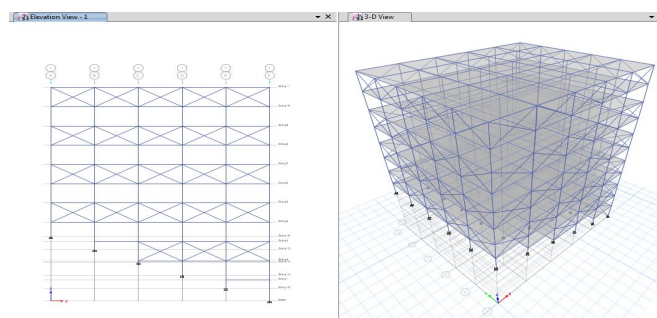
Elevation and 3D View of braced Building Model at 30 degree angle of sloping
